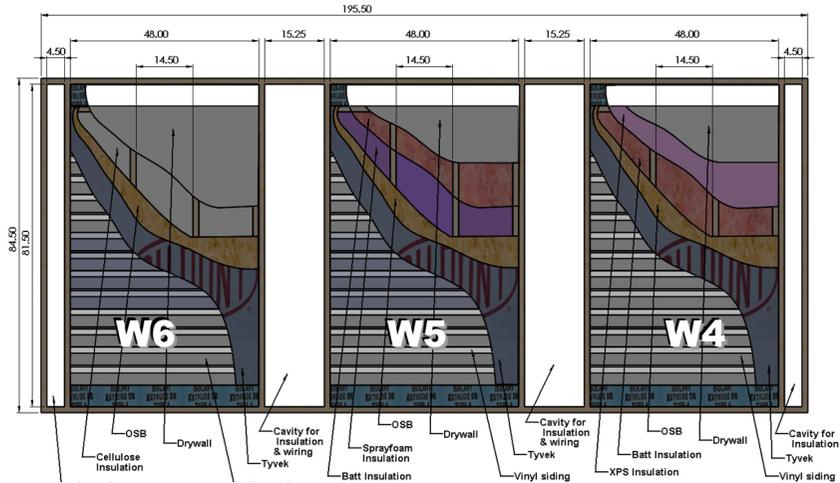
Schematic of three 38 mm x 140 mm (2 x 6 in.) wood-frame wall (residential) test specimens installed side-by-side in FEWF
